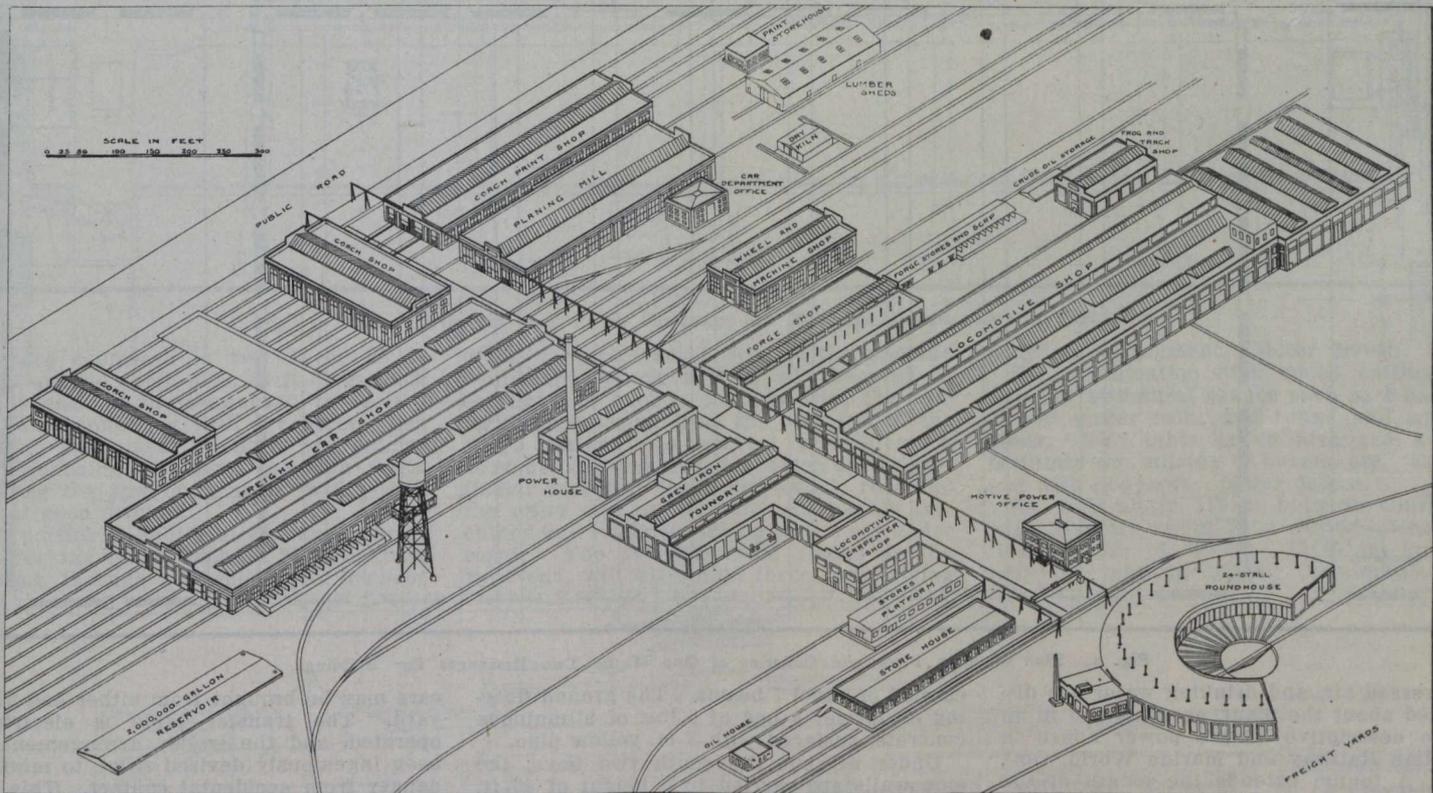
Isometric Projection of Locomotive and Car Department Buildings, National Transcontinental Railway
